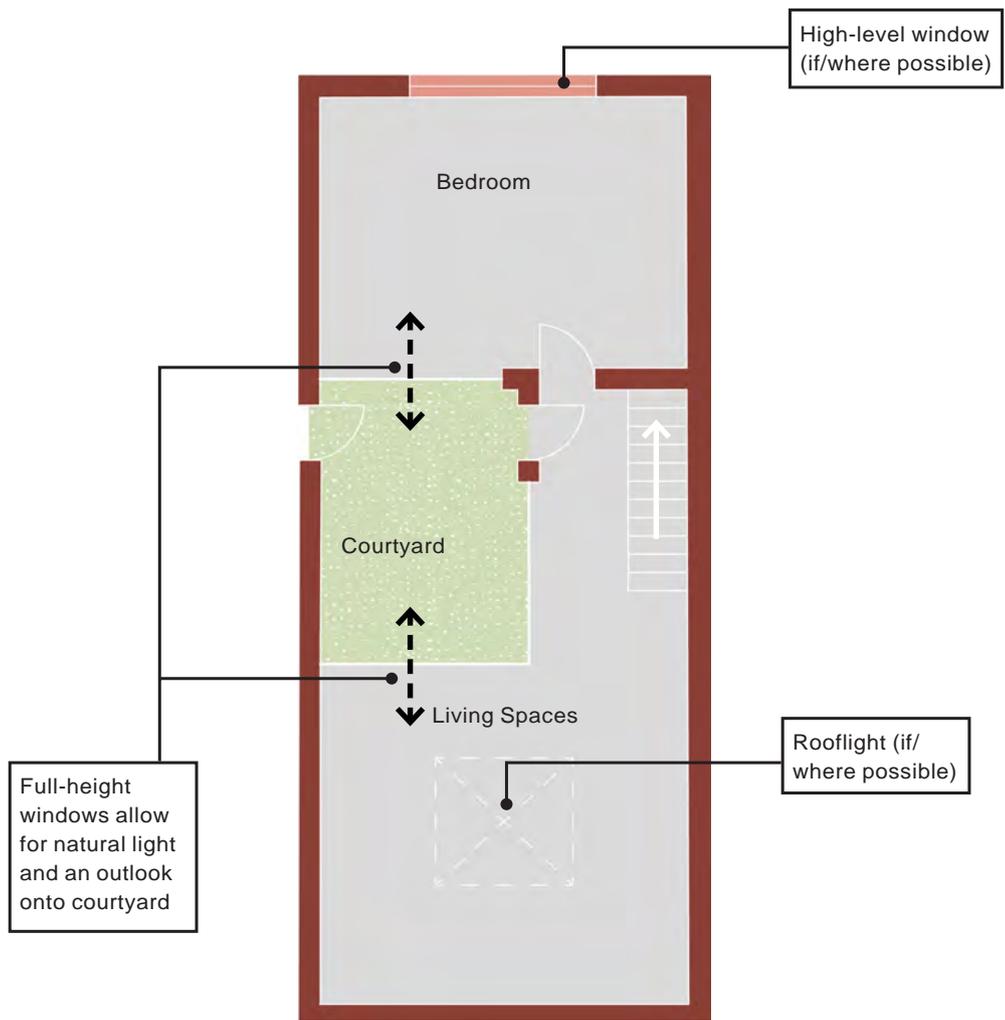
Diagram illustrating solutions to access natural light on a constrained site that limits externally facing windows.
